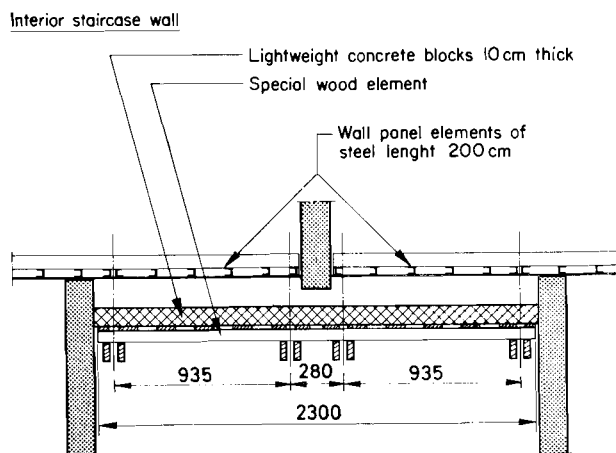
A detailed set-up drawing showing the use of a wood panel element connected with steel panel elements on staircase wall. The wall has an insulation of 10 cm light-weight concrete which is piled against the wood panel element and fastened with nails. Holes are drilled for bolts through the light-weight concrete.
